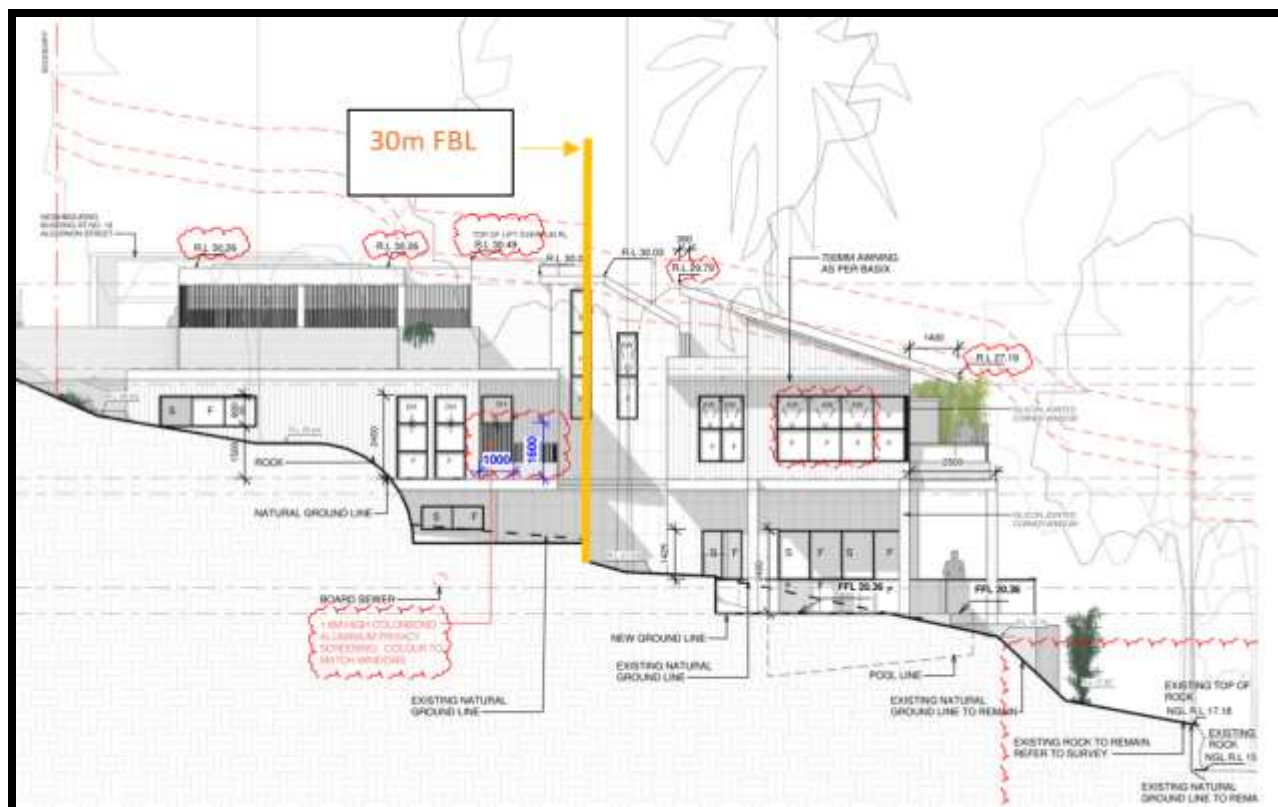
West Elevation showing the extent of the encroachment beyond the 30m FBL
